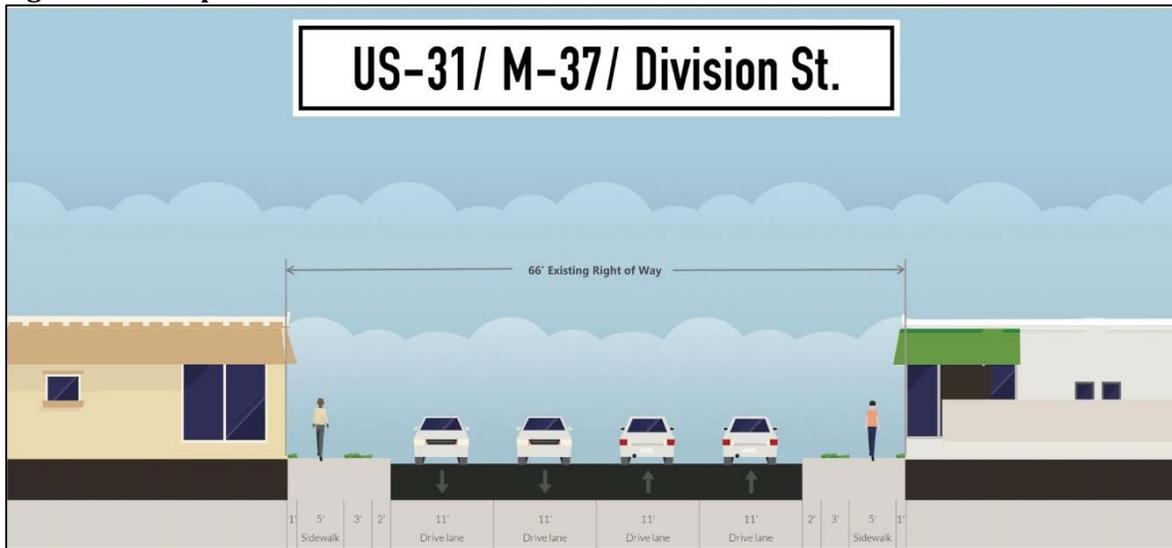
Proposed Cross Section North of Seventh Street
